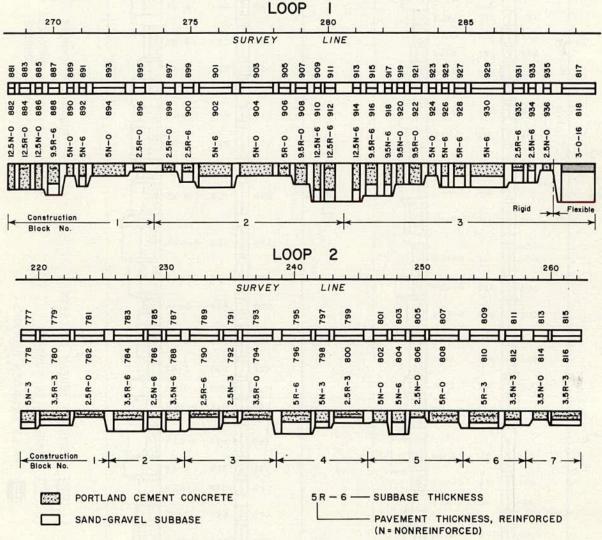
Layout of rigid tangent, Loops 1 and 2.
